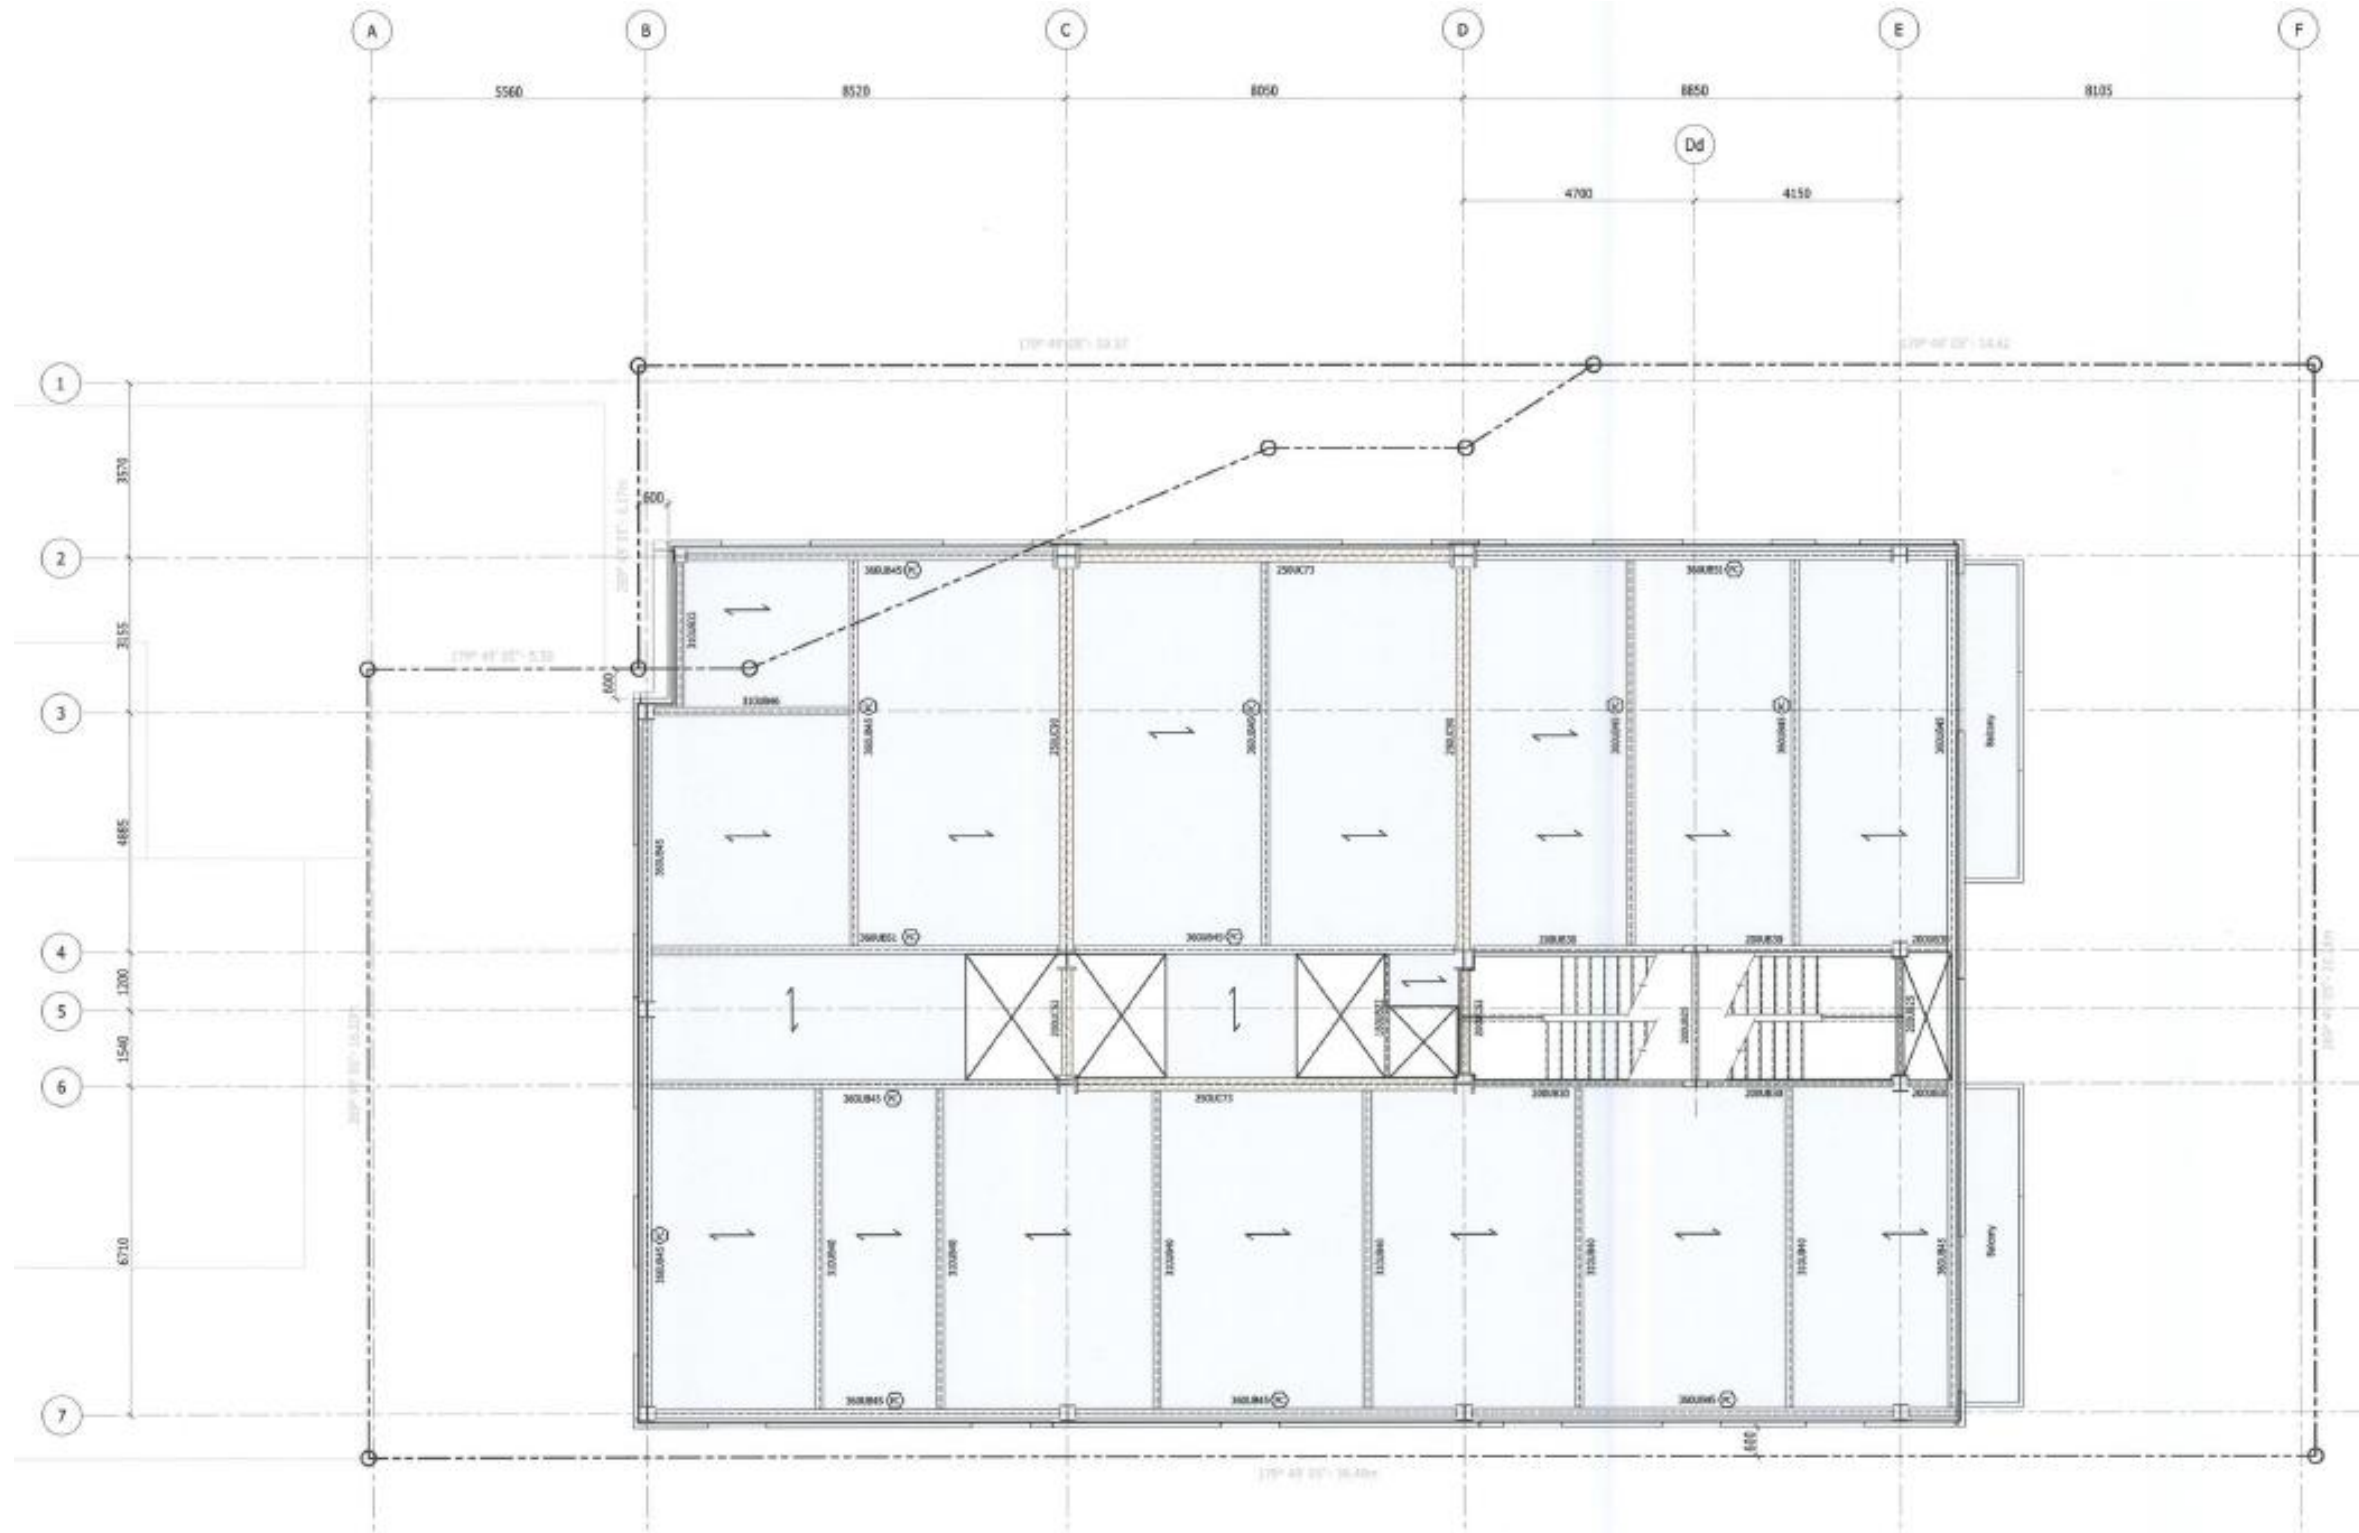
Structural Plan Level 12 (Christchurch City Council 2016c)
